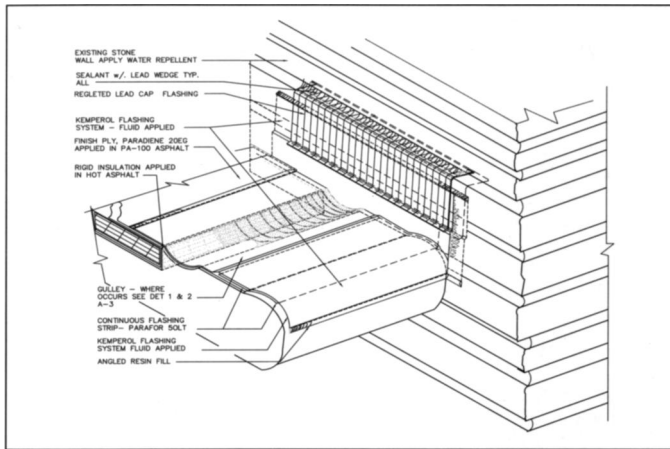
Axonometric detail of modified-bitumen-roofing system, showing the base flashing terminating on the roof roll and new lead cap flashing inserted into a reglet.
